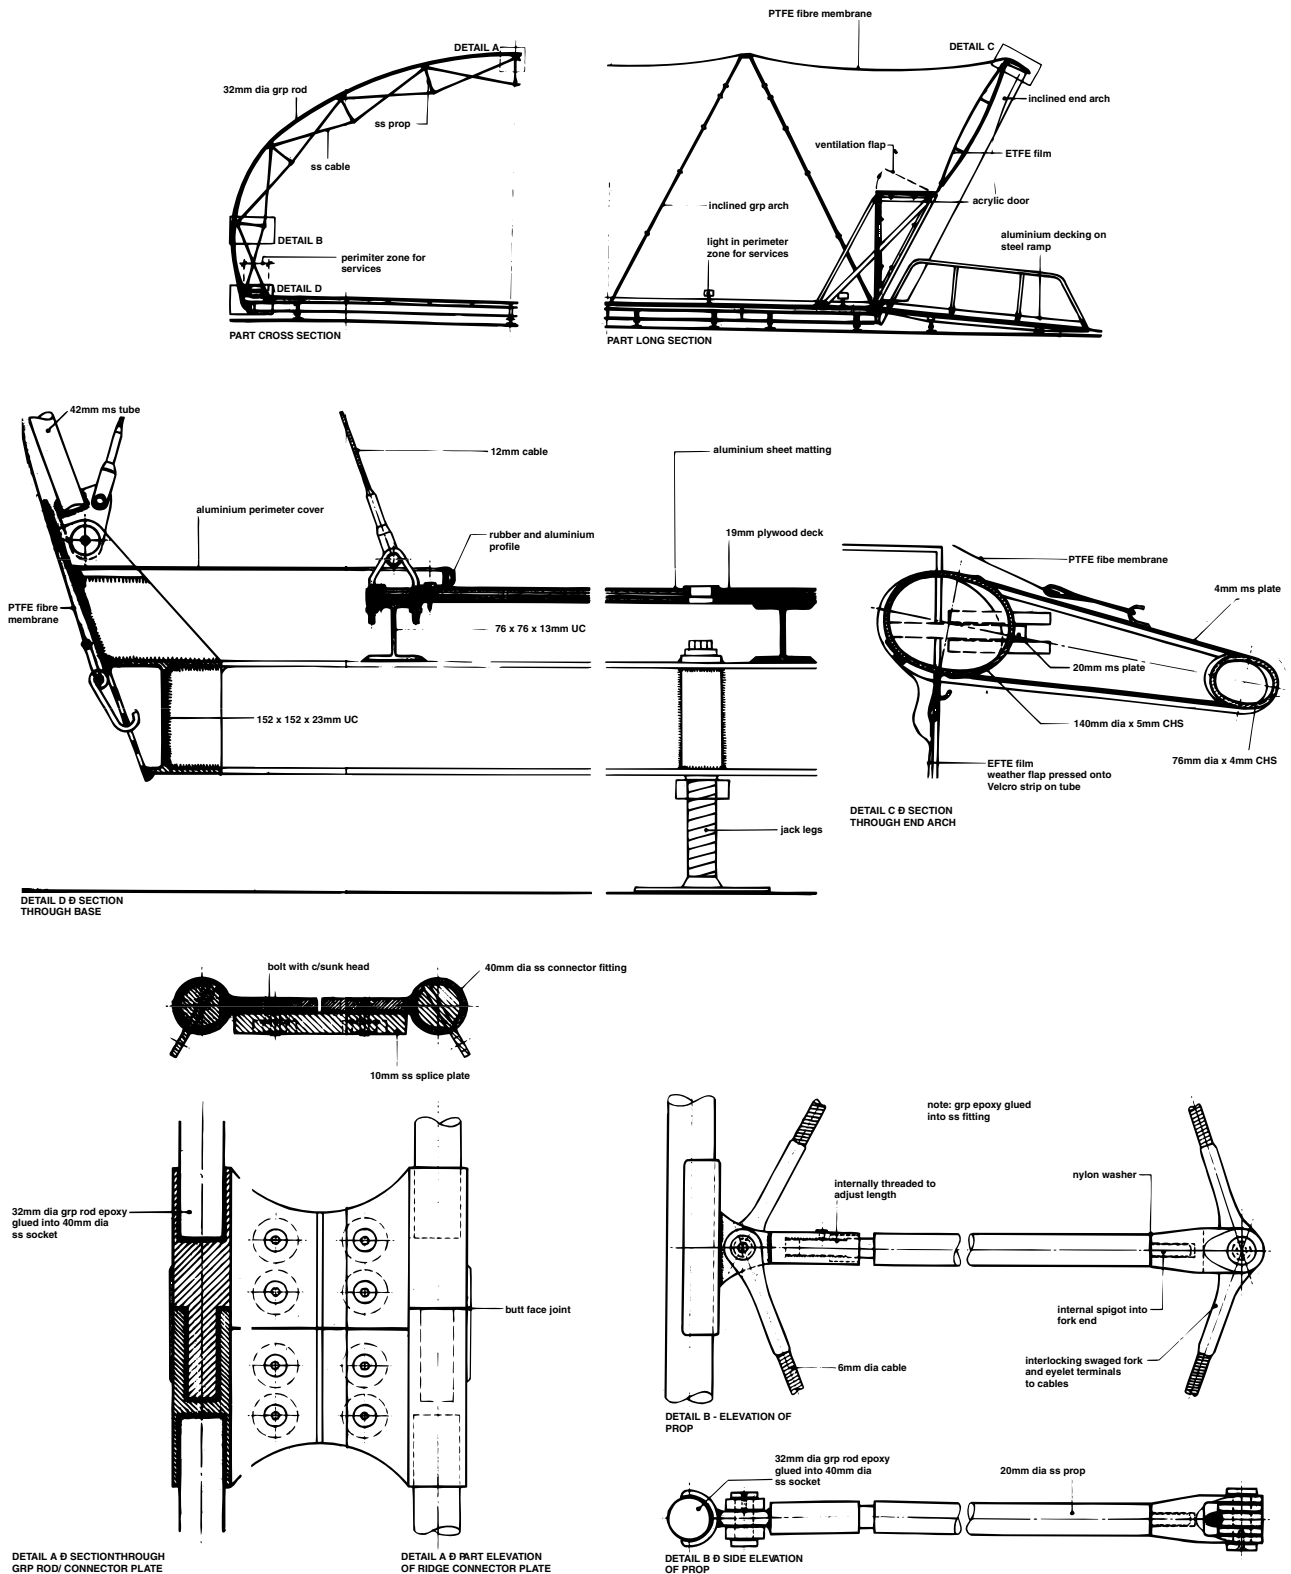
MoMI pavilion. Top: part cross-section and part long-section, centre: section through base and end arch, bottom: GRP rod structure details.
